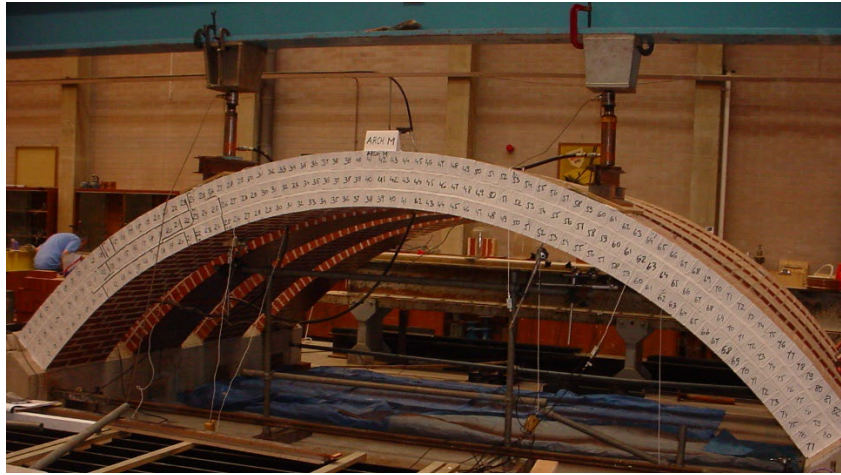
Masonry arch bridge full scale at University of Salford (Augustus-Nelson et al., 2017).
